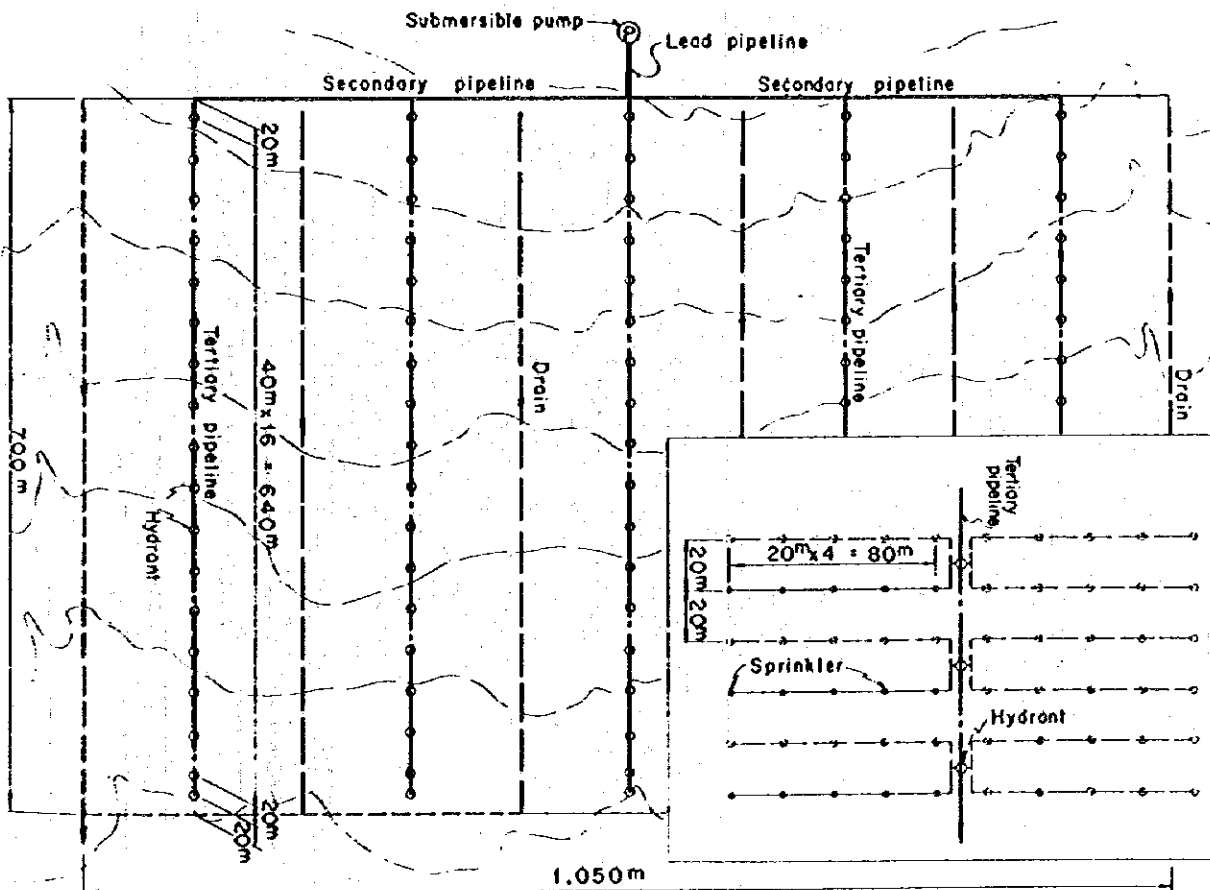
TYPICAL LAYOUT OF SURFACE AND SPRINKLER IRRIGATION SYSTEMS
